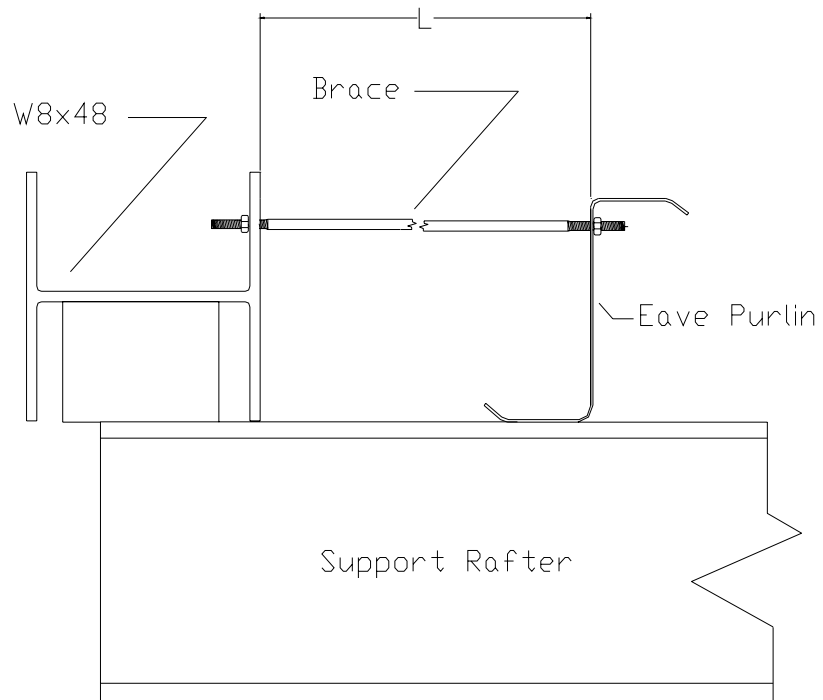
Typical Instrumented Rod-to-Purlin Connection
